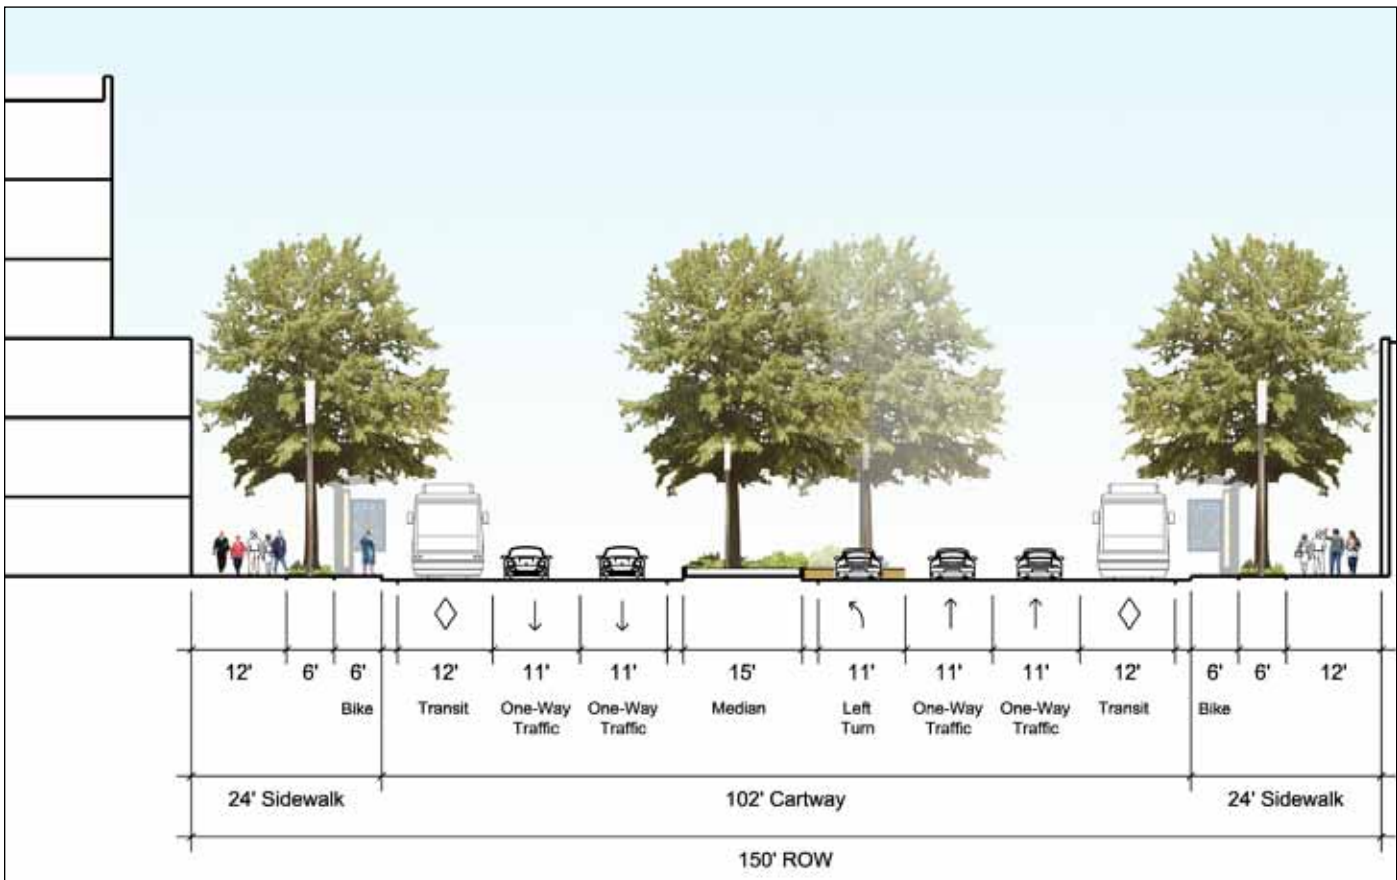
Van Dorn Street North of Edsall Road. This section shows the addition of dedicated curbside transit lanes on both sides of Van Dorn Street. A retaining wall is shown on the east side of Van Dorn Street adjacent to the EOS-21 Apartments.
